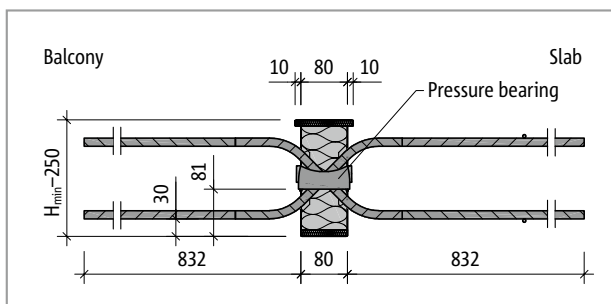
Schöck Isokorb® T type Q-VV12: Product section
